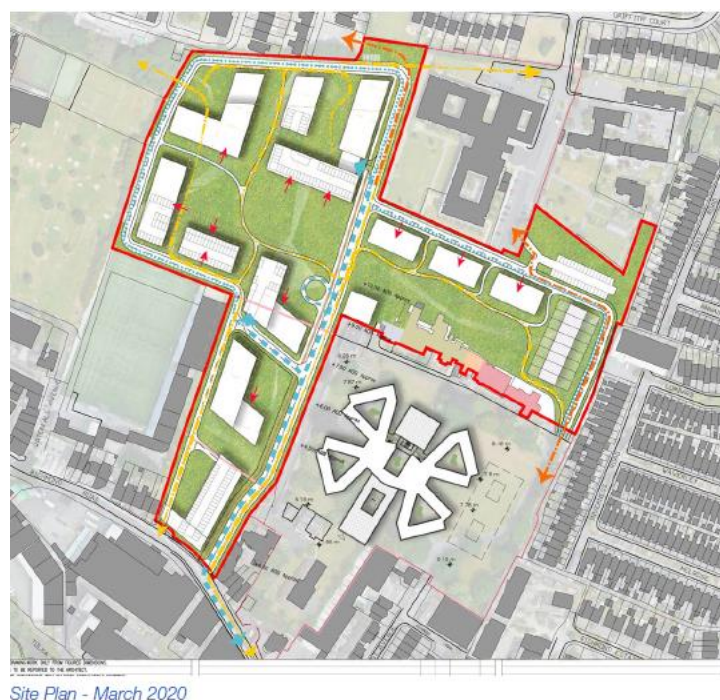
Site Layout Initial Concept (STW March 2020)
